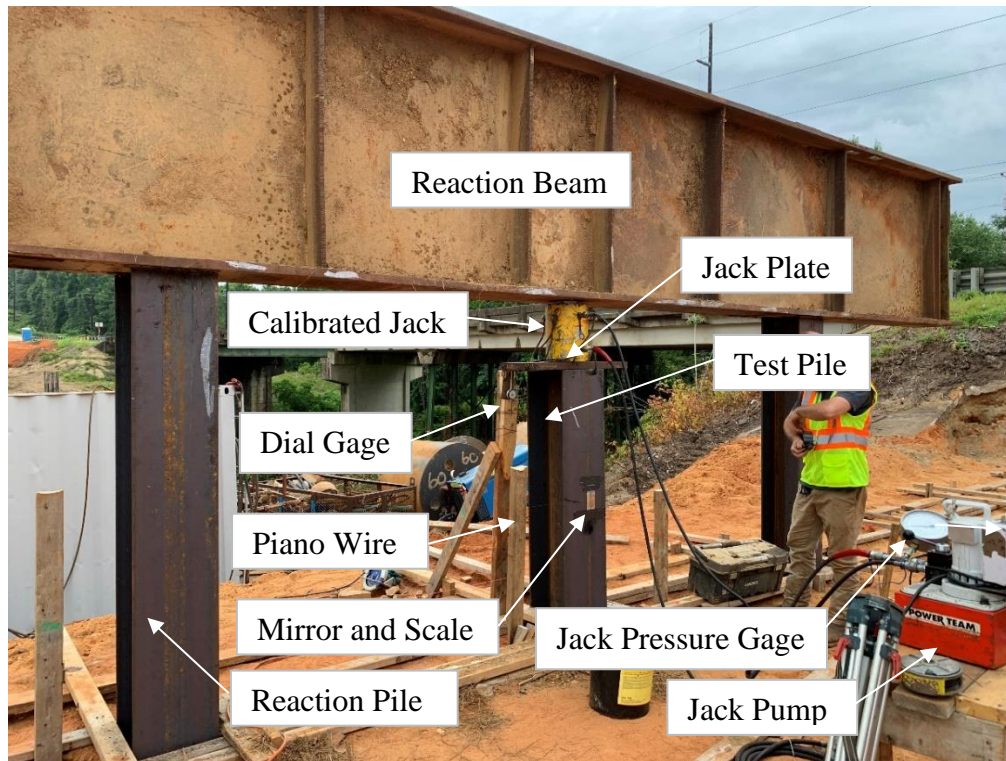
Static Load Test Setup from ALDOT Project in Prattville, AL
